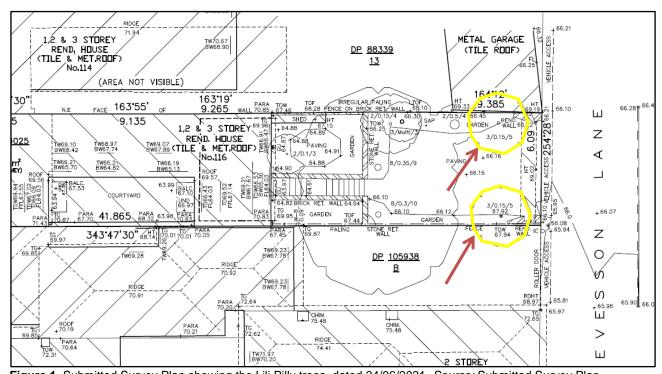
Submitted Survey Plan showing the Lili Pilly trees, dated 24/06/2021. Source: Submitted Survey Plan
